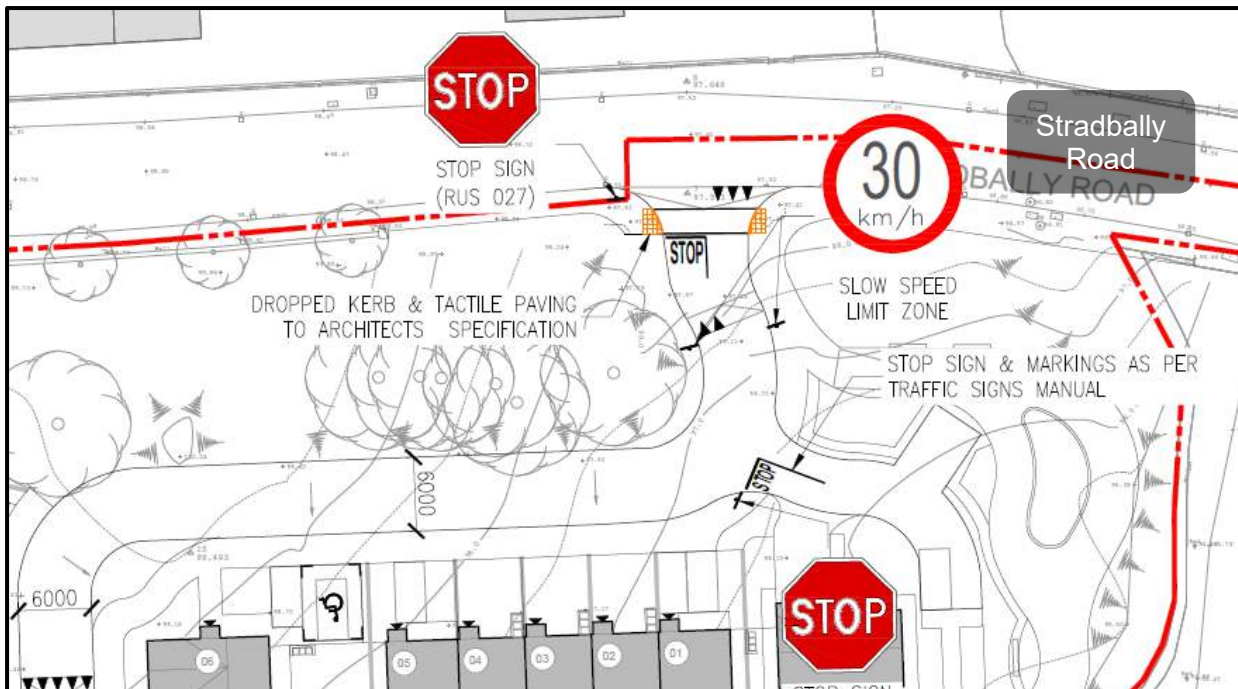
Proposed Stradbally Road/ Internal Access Road junction Layout (Source: Van Dijk Architects)
